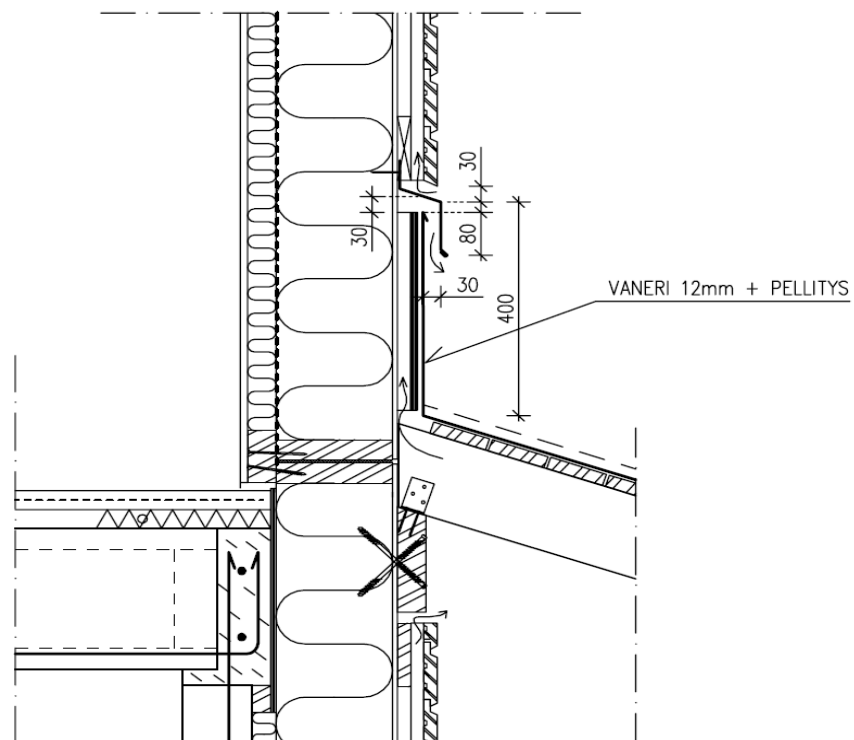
Detail drawing of the balcony roof. Nieminen A. 2014. Detail drawing 8.01.
